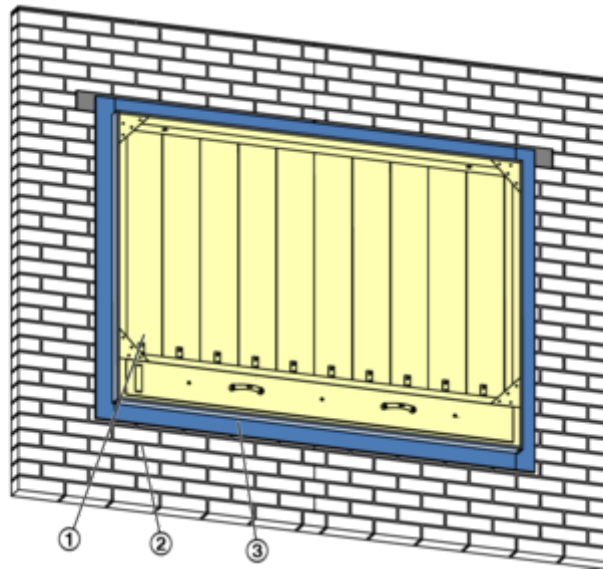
Installation example EK-JZ Dry mortarless installation in solid wall, solid shaft wall EI 120 S
